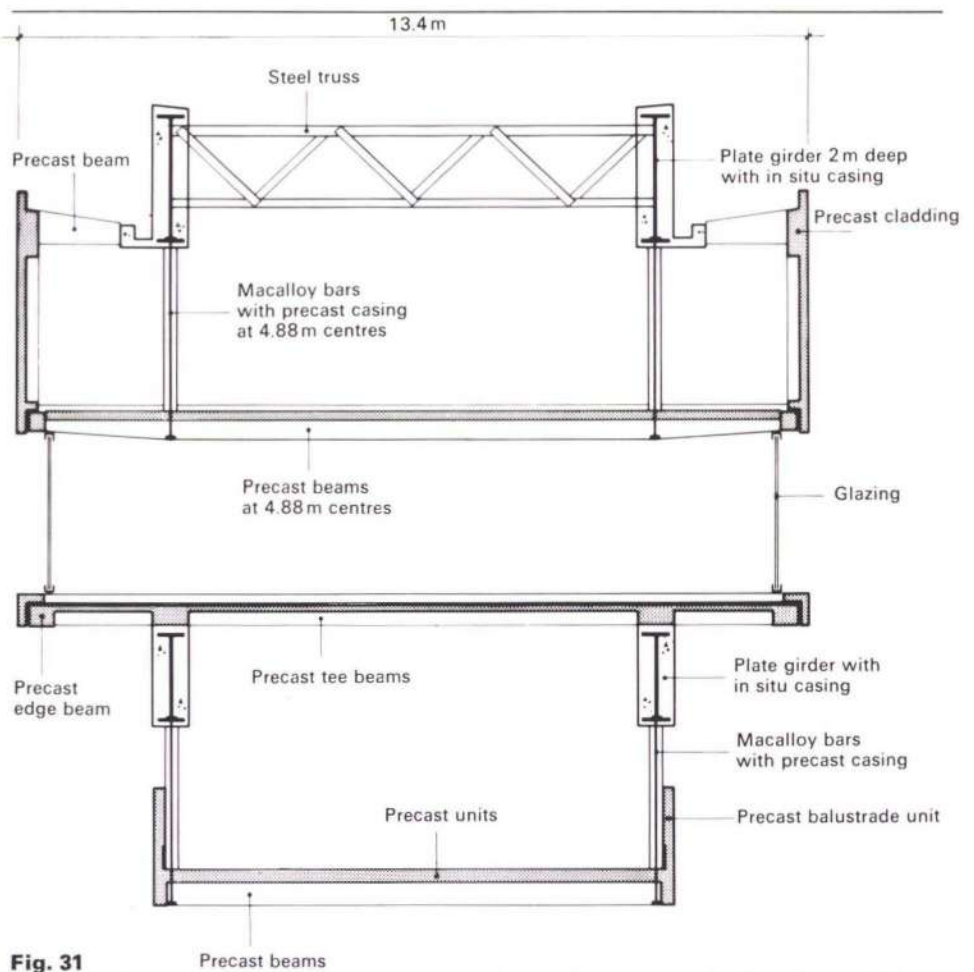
Link block 7, top storey suspended from roof girders, walkway suspended from lower girders
